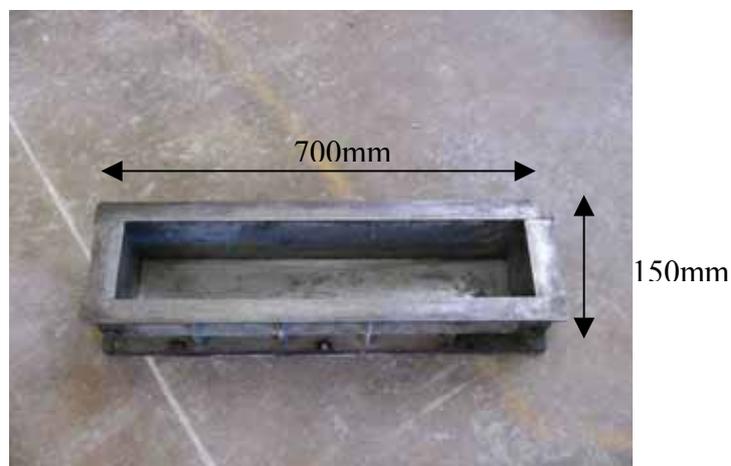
Beam mould with dimensions of 150mm x 150mm x 700mm.
